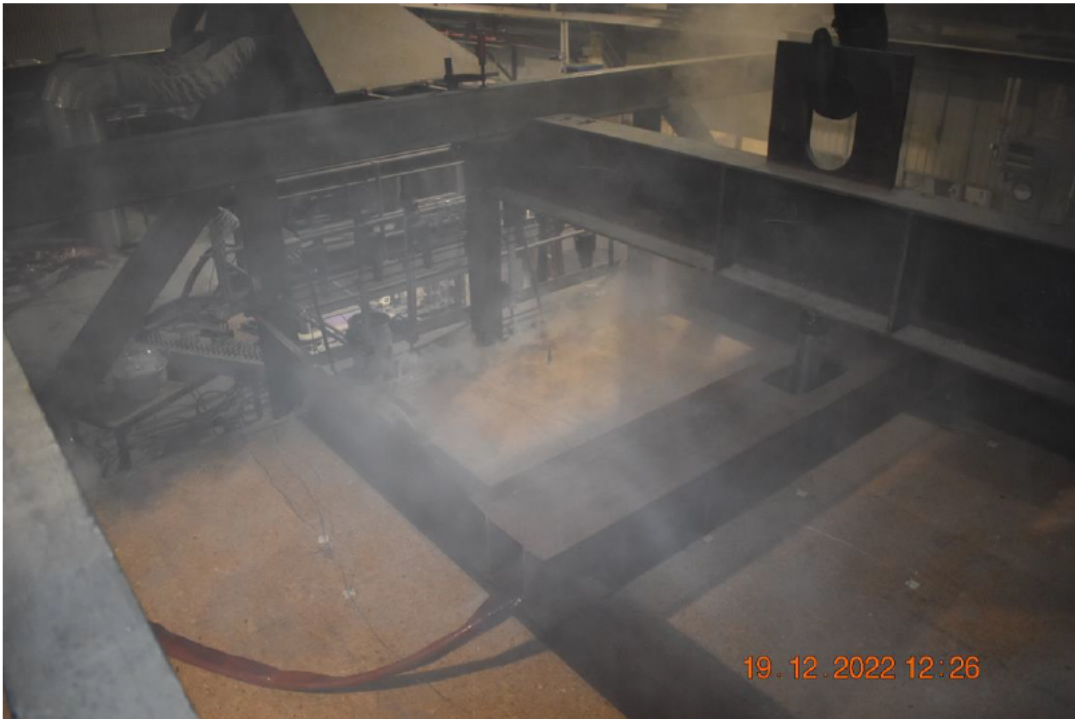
Test specimen seen from unexposed side after 29 minutes of testing
